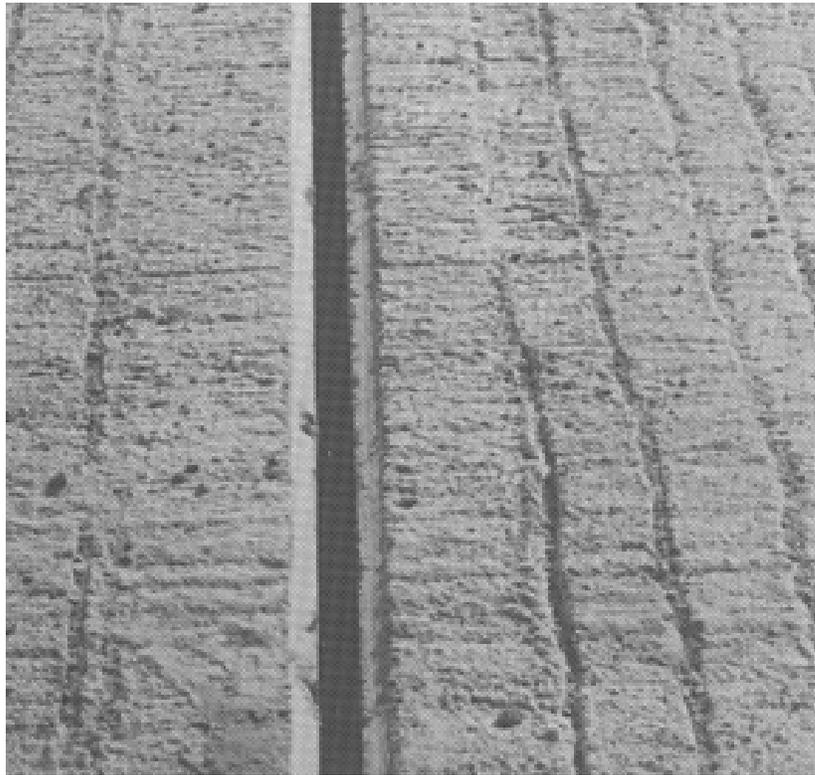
Beveled edge transverse contraction joint after the pavement surface has been ground.
